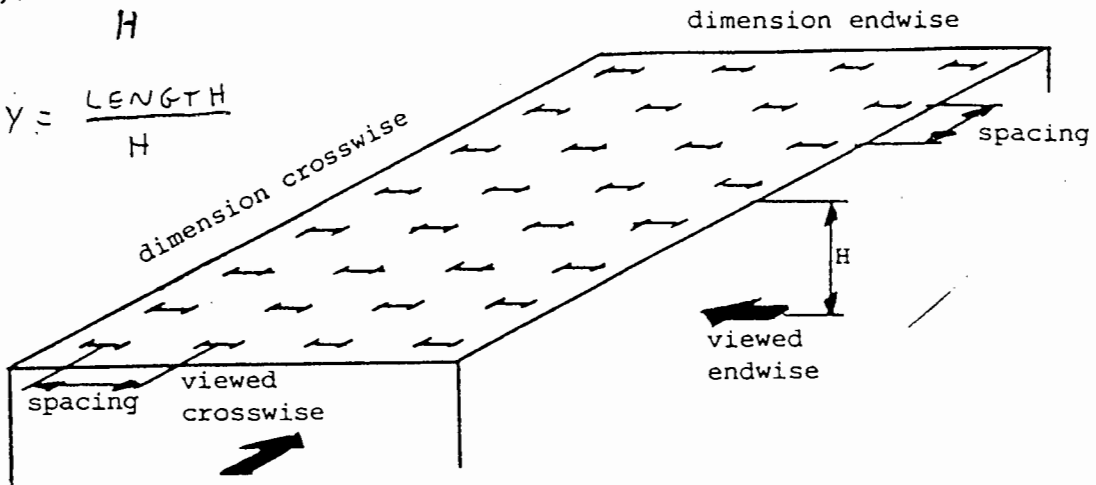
Conventional lighting installation with identical luminaires mounted with uniform spacings in a horizontal mounting plane.
